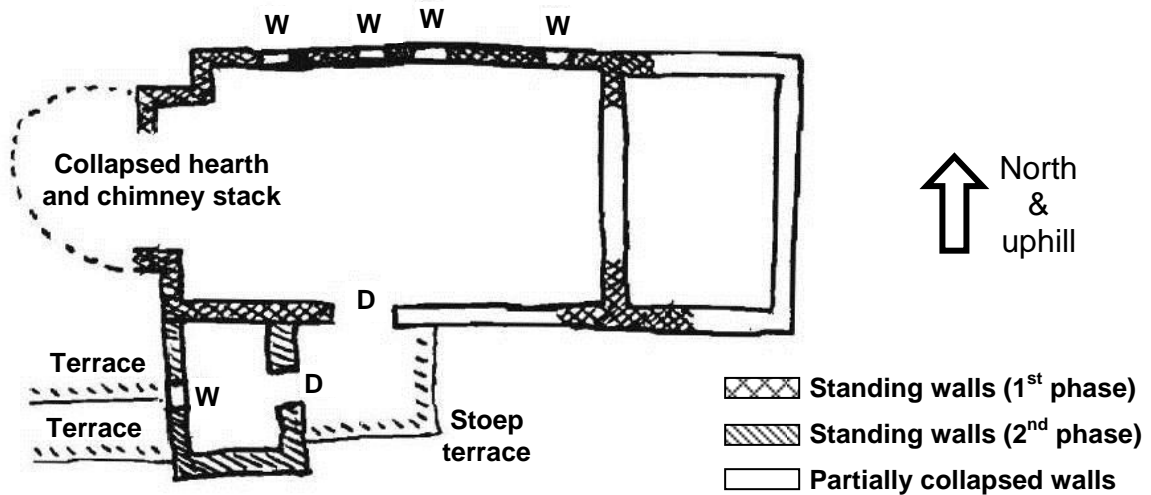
Schematic floor plan of the house at KV2013/002 (point 009). Windows (W) and doors (D) are indicated for the standing walls, while the other walls were too badly deteriorated and obscured by bush to determine the positions of openings. Drawing not to scale.
